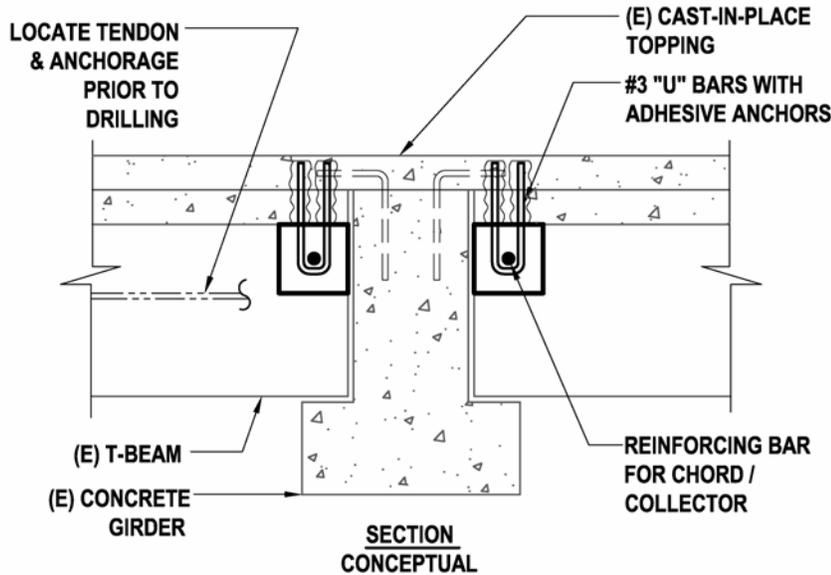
Added or Enhanced Chord or Collector at Floor Interior with Cast-In-Place Topping Slab
